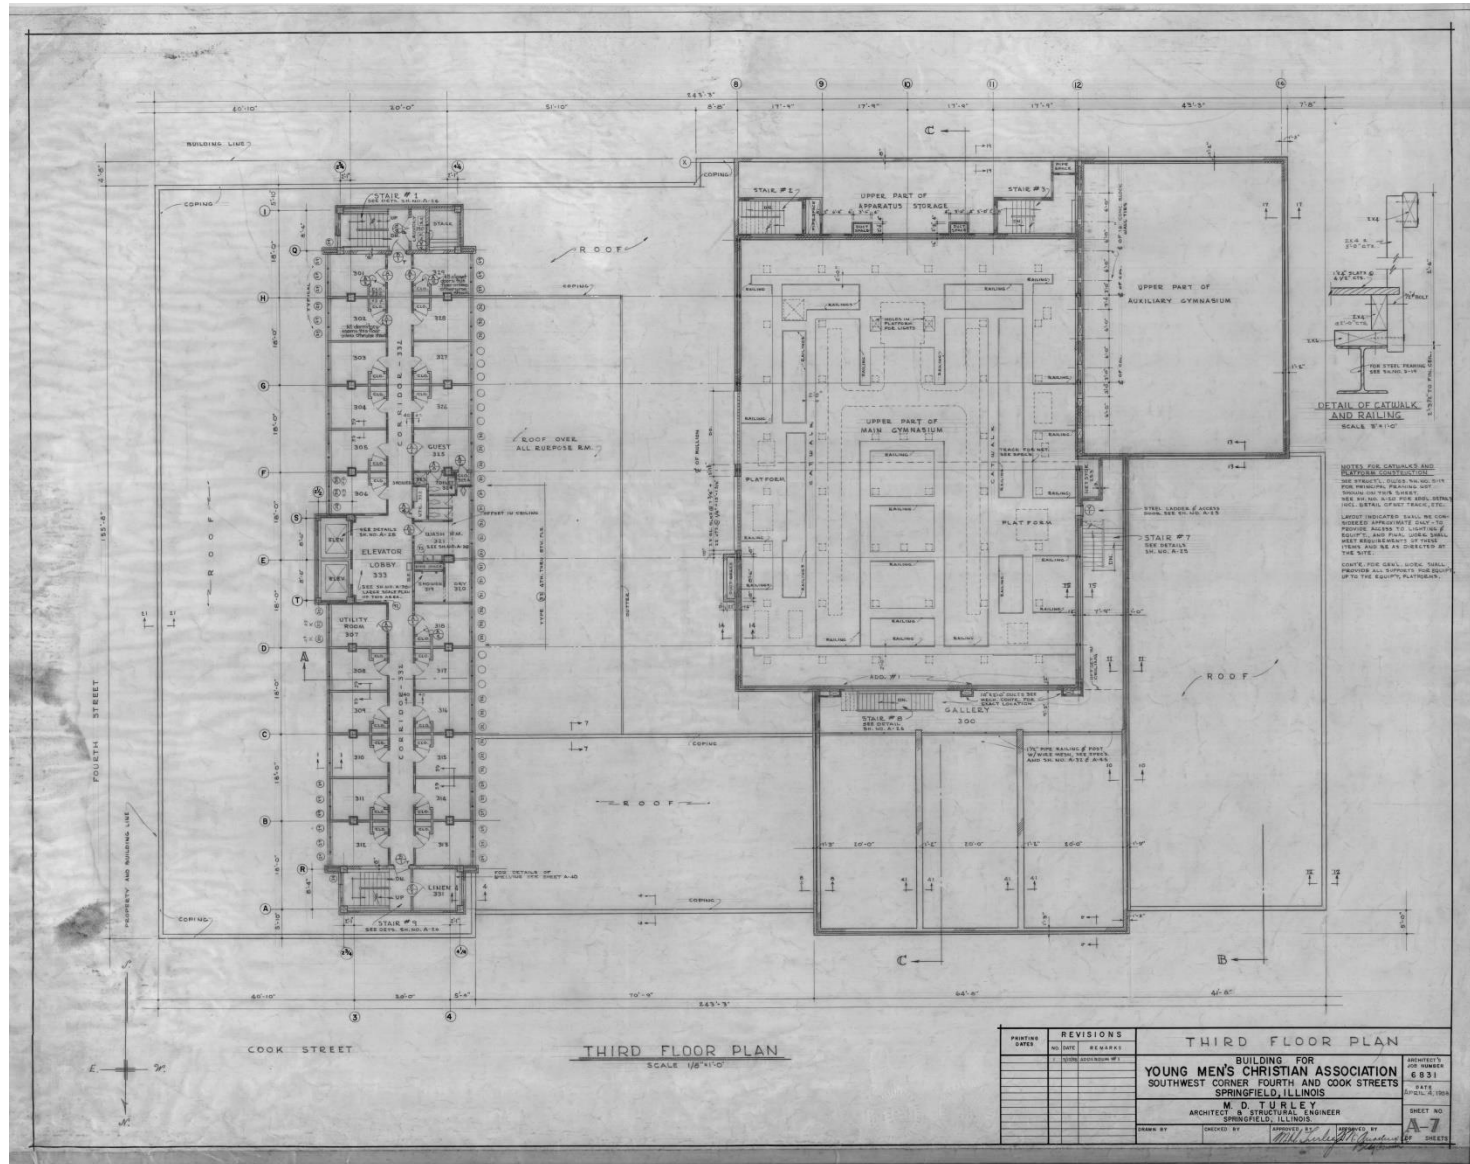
Third Floor Plan, Building for Young Men's Christian Association (Turley 1958: Sheet No. A-7).
